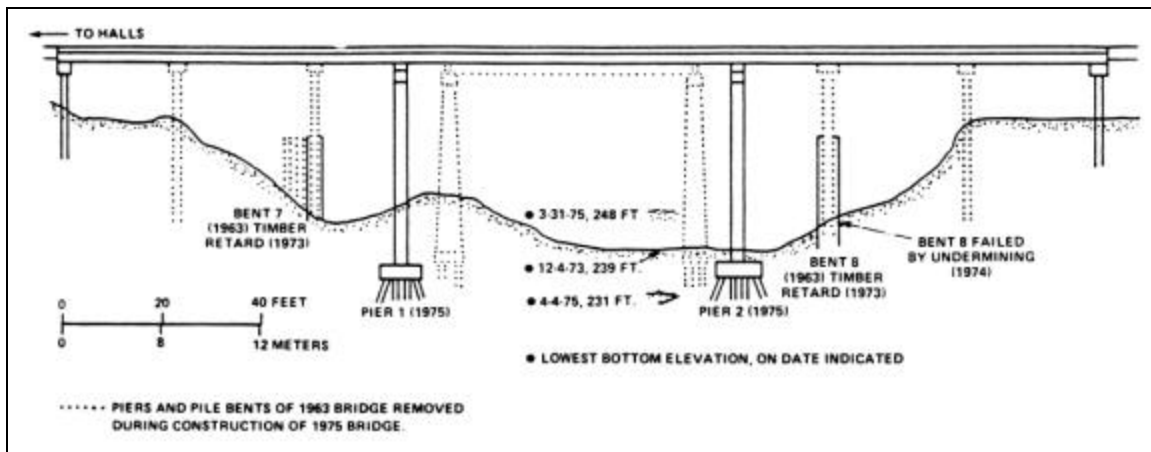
Elevation sketch of U.S. Highway 51 Bridge (Example 8).
